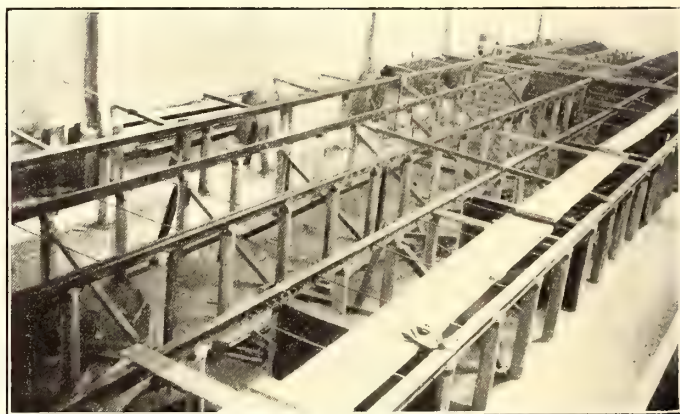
METHOD OF SUPPORTING PIT TRACKS ON REINFORCED CONCRETE POSTS, CONCRETE STEPS AND CASE WALLS BETWEEN PITS
